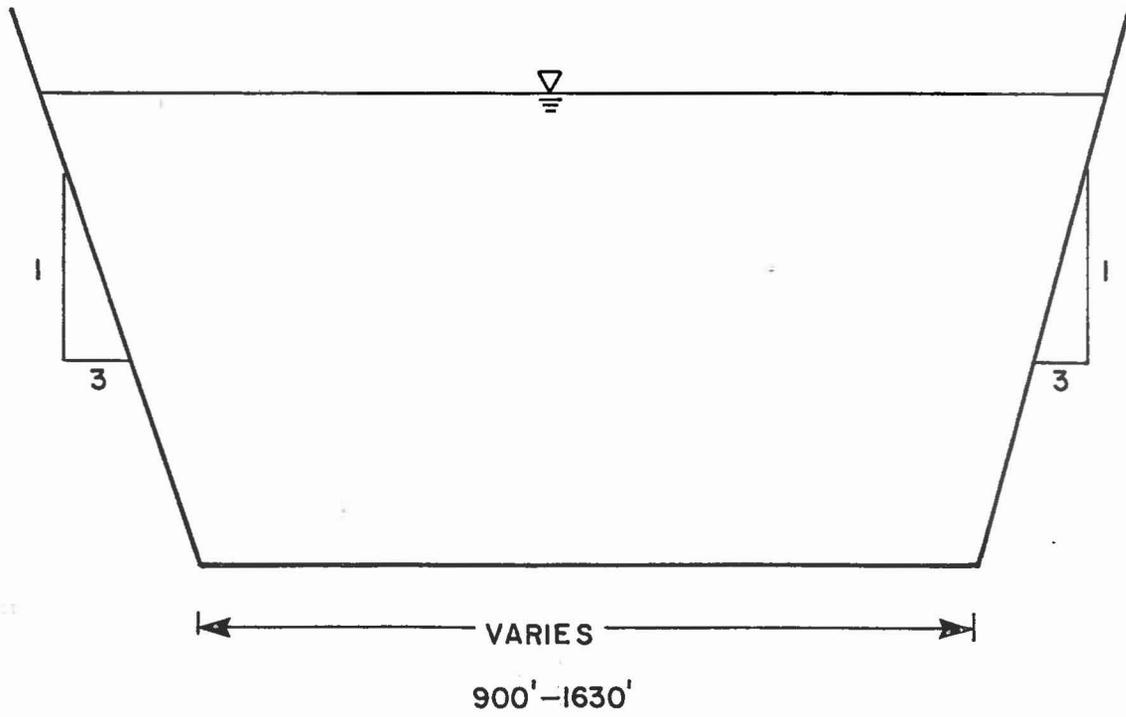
Typical cross section of proposed channelization between Camelback and Buckeye Roads.
